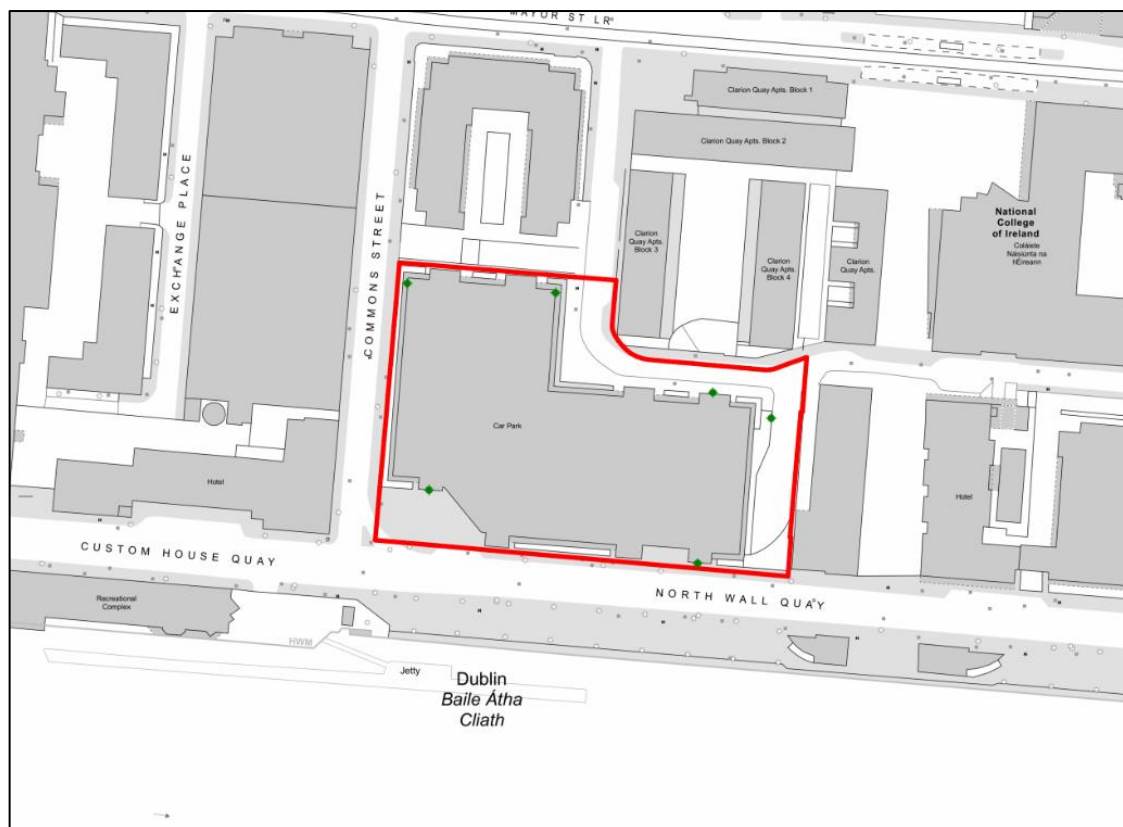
Site Location Plan (Source: 1NWQ-HJL-AX-00-DR-A-0001)
